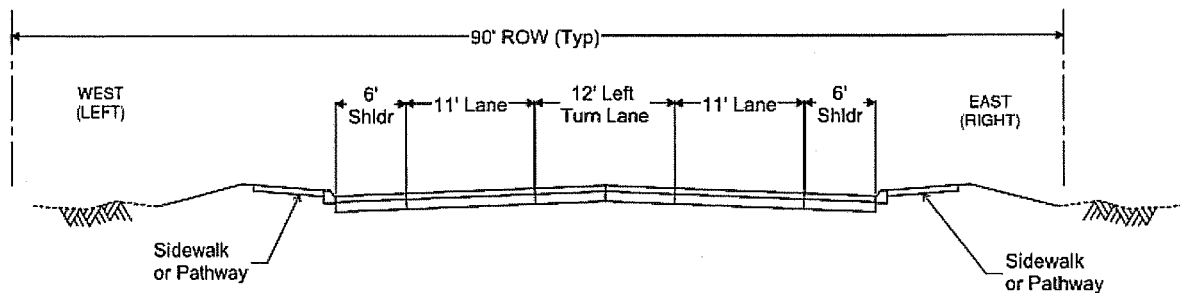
Typical section with adjacent sidewalk or pathway, both sides
